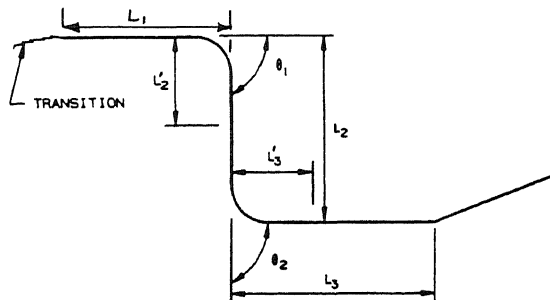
Plan view of cable routing in tray-to-penetration sleeve transition (building-to-building)
